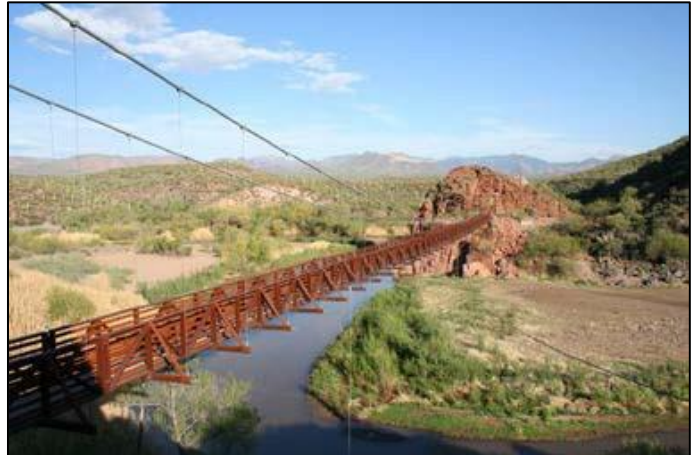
Source: bridgemeister.com. Replica suspension bridge at Verde River.
